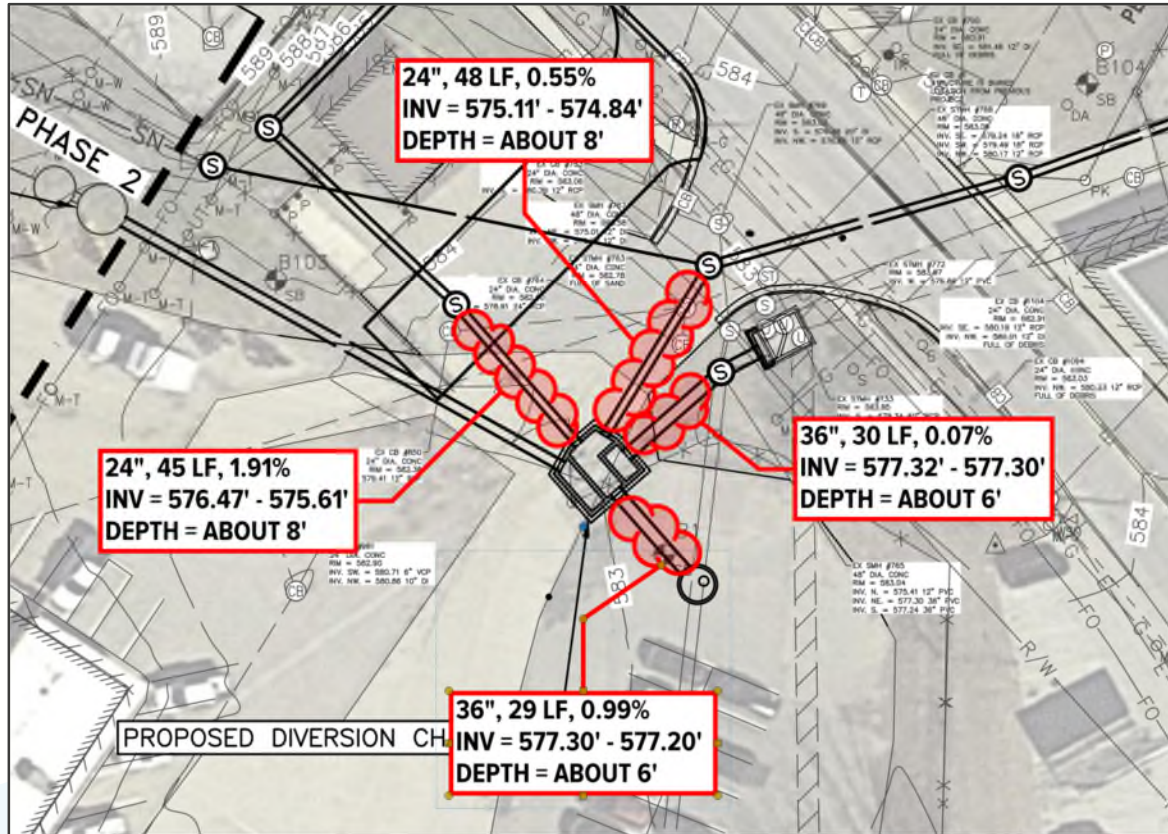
Sections of sanitary sewer pipe to be supported using deep foundations.
